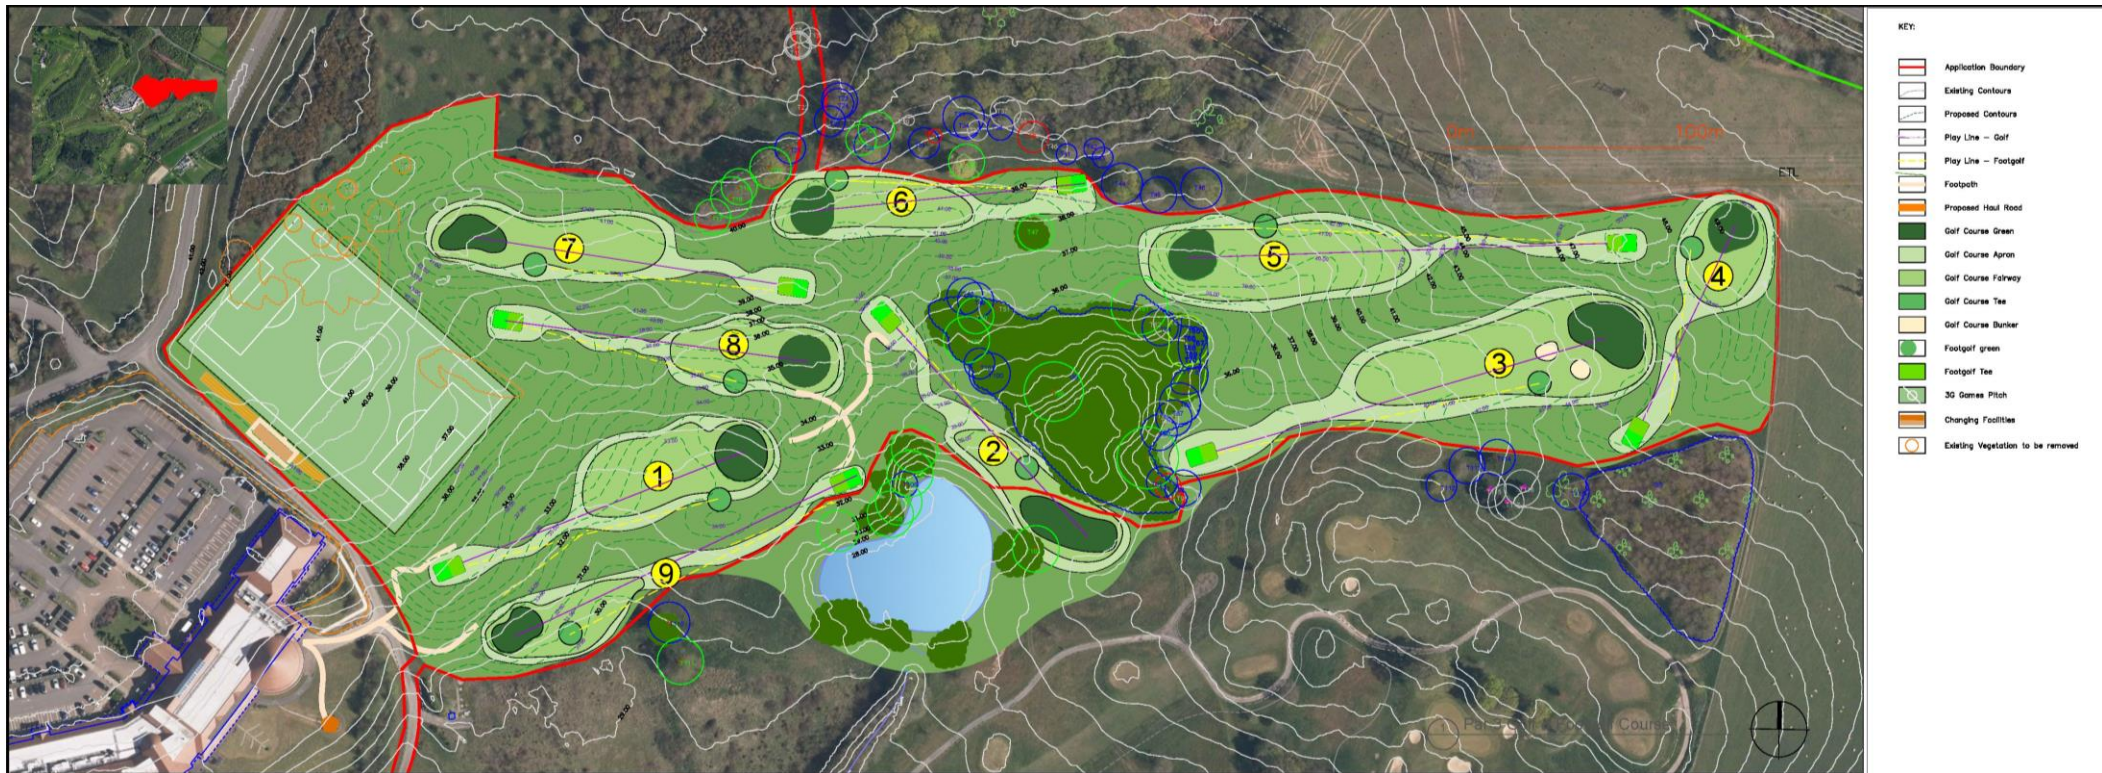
Proposed Layout & Grading Proposals - See also scaled plan WD800GO1
